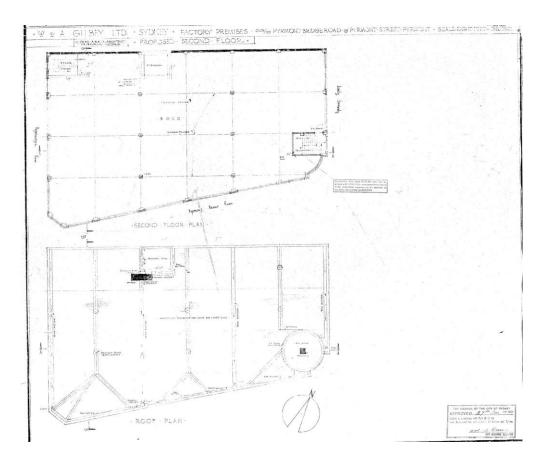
1950 – Second floor plan and roof plan for proposed second floor (third storey) for W & A Gilbey Ltd Factory Premises, by C. Orme, architect, approved 27 January 1950 (Source: City of Sydney Archives, Pyrmont Bridge Rd NW cnr & Pyrmont St (adjacent No 135), new building (01/01/1947 - 31/12/1947), [A-00572010]. https://archives.cityofsydney.nsw.gov.au/nodes/view/1437047)
